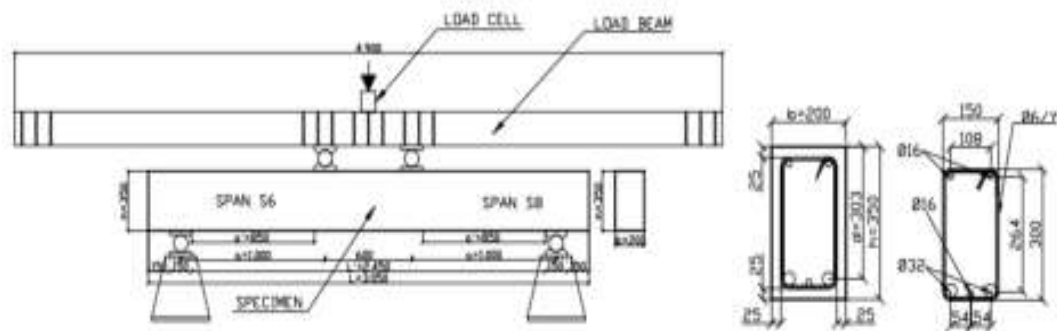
Typical beam and testing setup of Gonzalez et al. [36]
